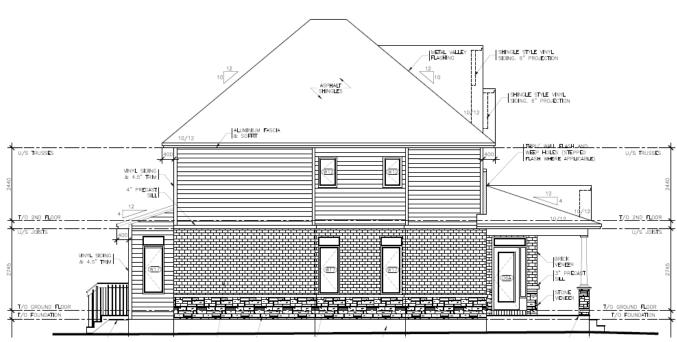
Typical street side elevation drawing of a proposed dwelling unit model
